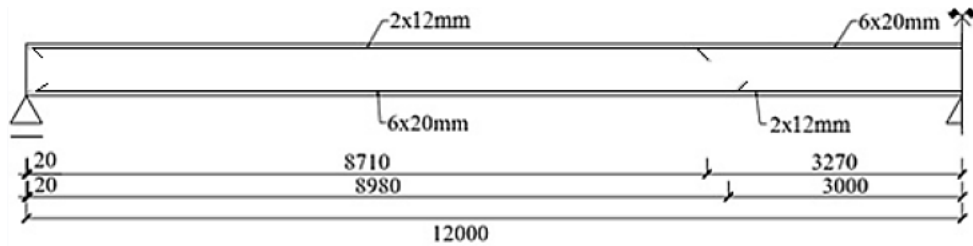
Reinforcement arrangement, dimensions in mm.
